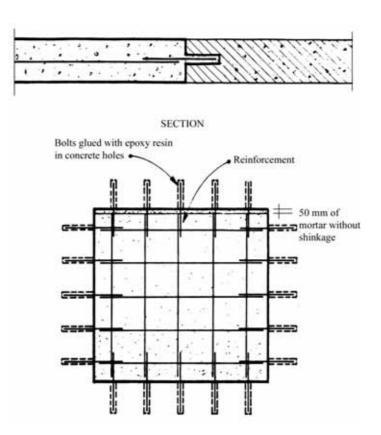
Details regarding the process of filling in the empty spaces of the structural walls with reinforced concrete
